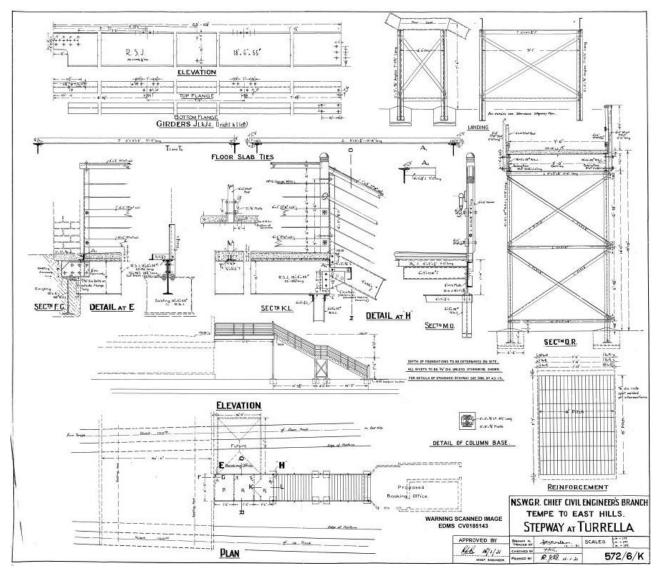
1931 plans of the stairway Turrella Railway Station
